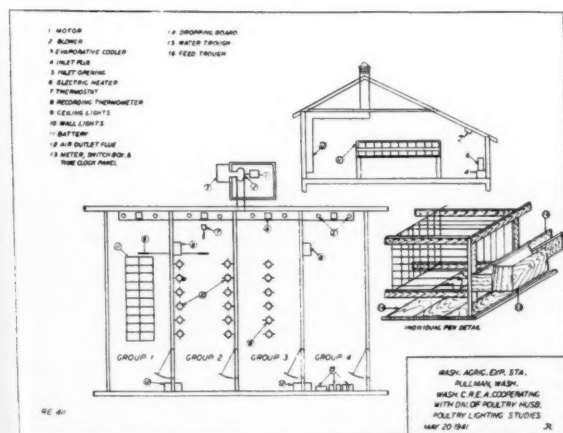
General arrangement of the pens and equipment in the Washington project to determine the fundamental electric lighting requirements for laying hens
